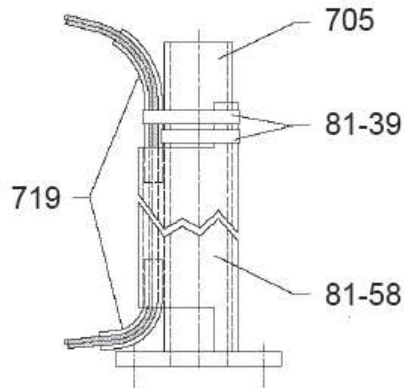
Routing the power cable with cable conduit along the vent pipe
